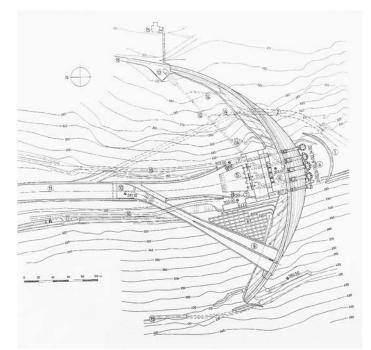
Ground plan of "Grancarevo" dam: 1. Cofferdam 2. Diversion tunnel 3. Dam 4. Intake structures 5. Machine house 6. Switchyard 7. Bottom outlets 8. Reinforcement of the left batter 9. Spillway 10. Stilling basin 11. Tailrace canal 12. Funicular 13. Funicular operating house 14. Access to inspection galleries 15. Measurements registration room 16. Access road to machine room 17. Porter's lodge 18. Access road to dam crest 19. Railway line Trebinje - Bileca
